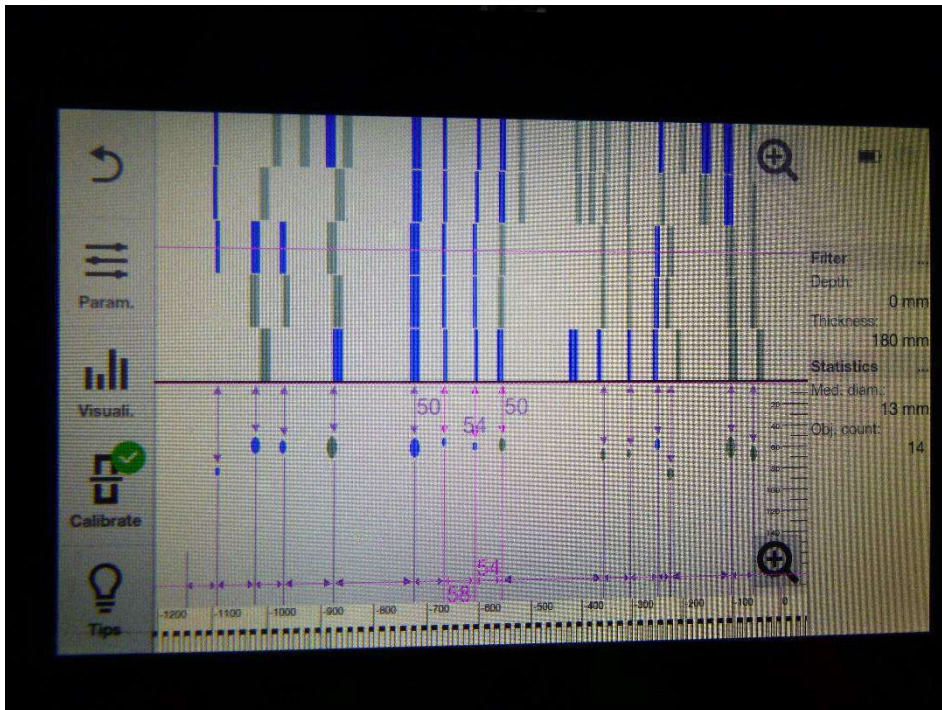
West half joint south face upper nib, scanned horizontally to show shear link reinforcement.
